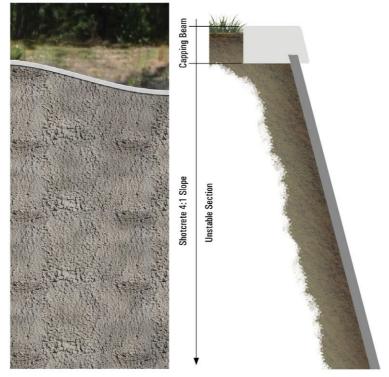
Typical Cutting Treatment Section and Elevation of Full Shotcrete Cutting face
